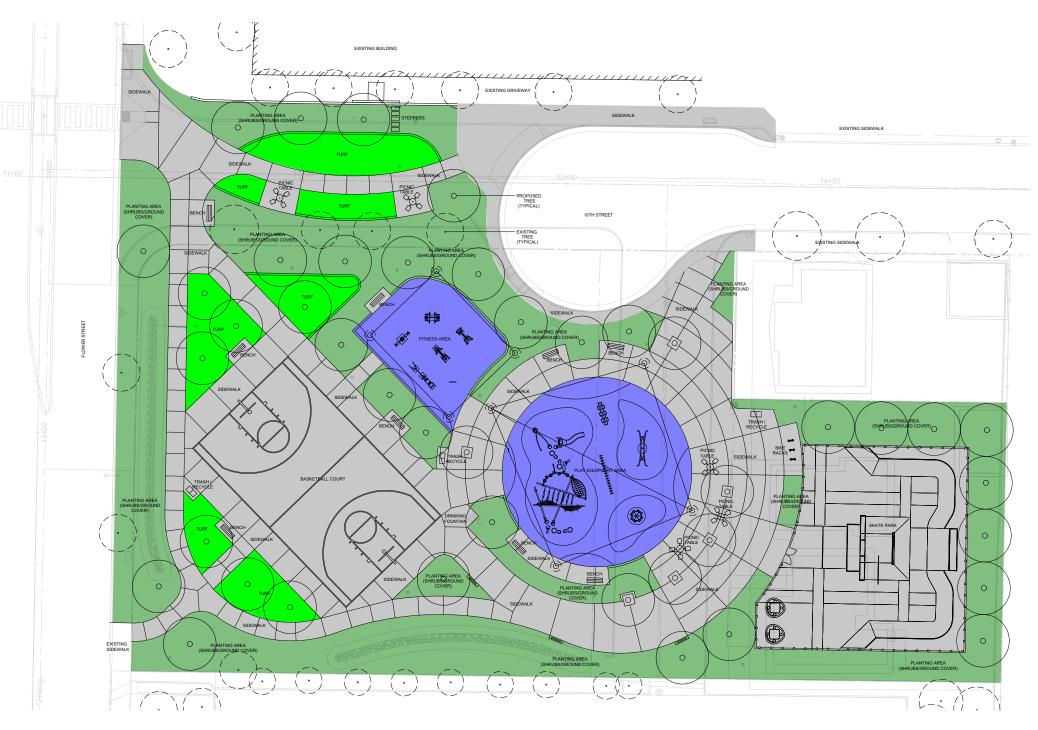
Project Site Plan 2023-145 10th and Flower Park Project
